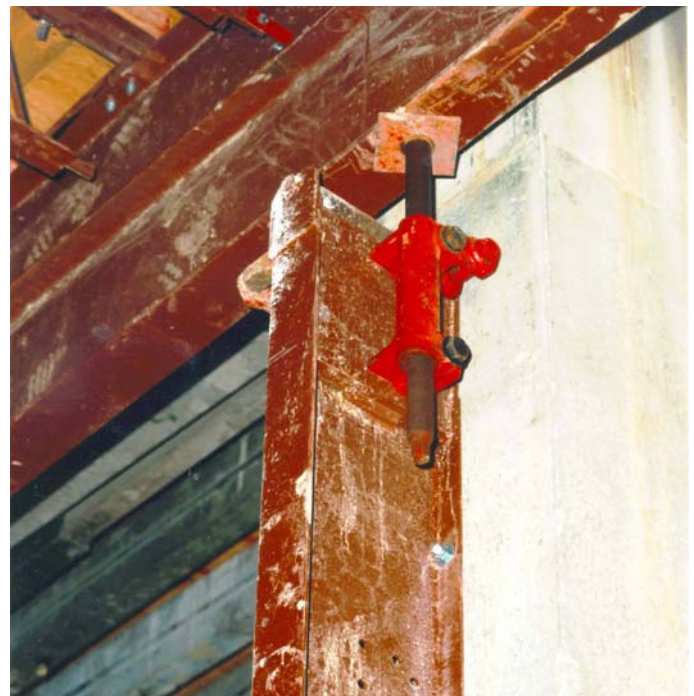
Top of temporary steel column showing one of the top pair of 5/8 inch diameter expansion bolts.
